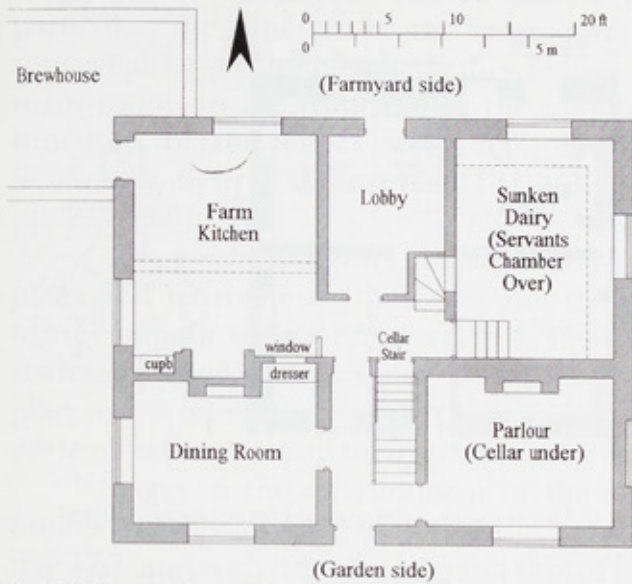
Pitstone Green Farm, Pitstone Green, Buckinghamshire (SP937156), built in 1830 for the Earl of Bridgewater: ground floor plan.
